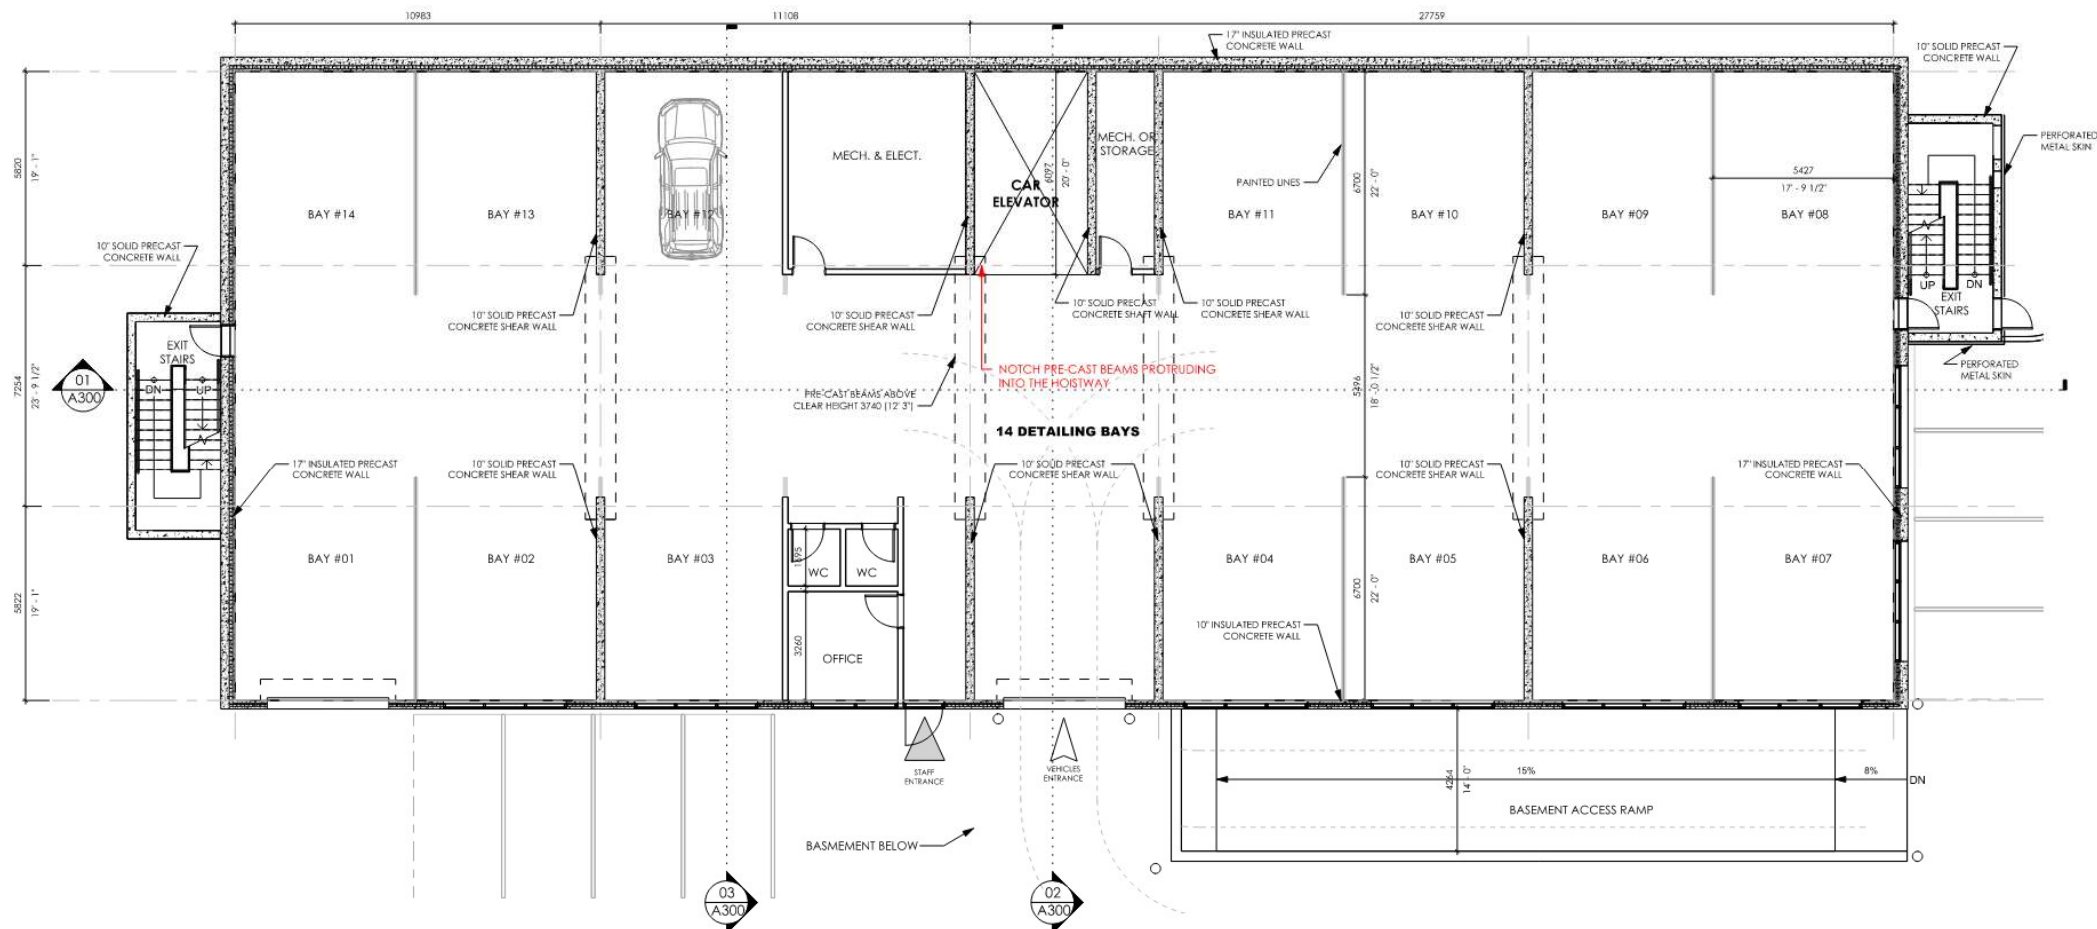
Ground Floor Plan at 299 West Hunt Club Road.
